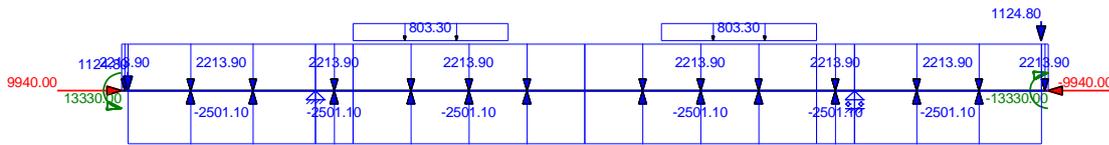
, PRESTRESSING MODEL SET-UP LOAD COMBINATION C
